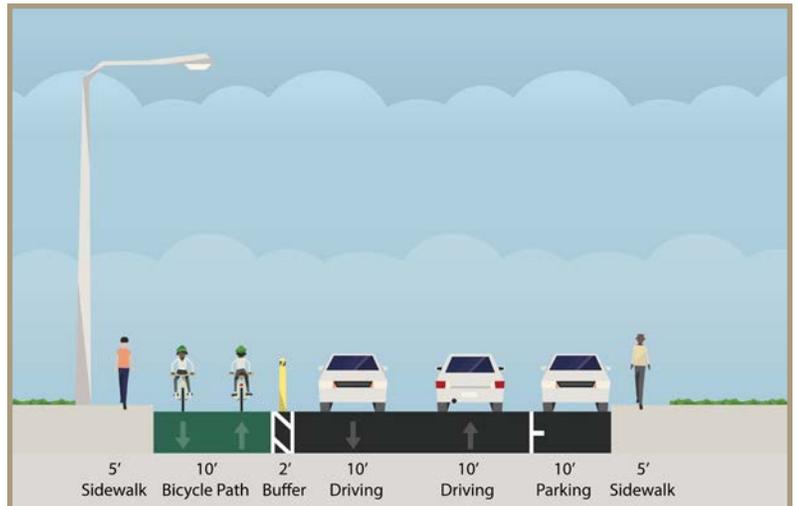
Whalen Street with an on-street bicycle path replacing a parking lane, looking north.
